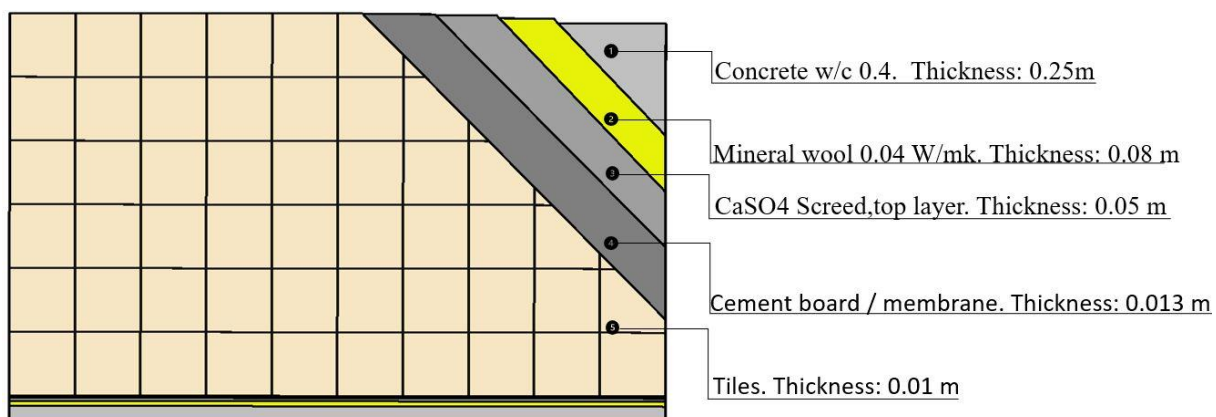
Bathroom floor between apartments. Byggforsk 541.805 Floors in bathrooms and
